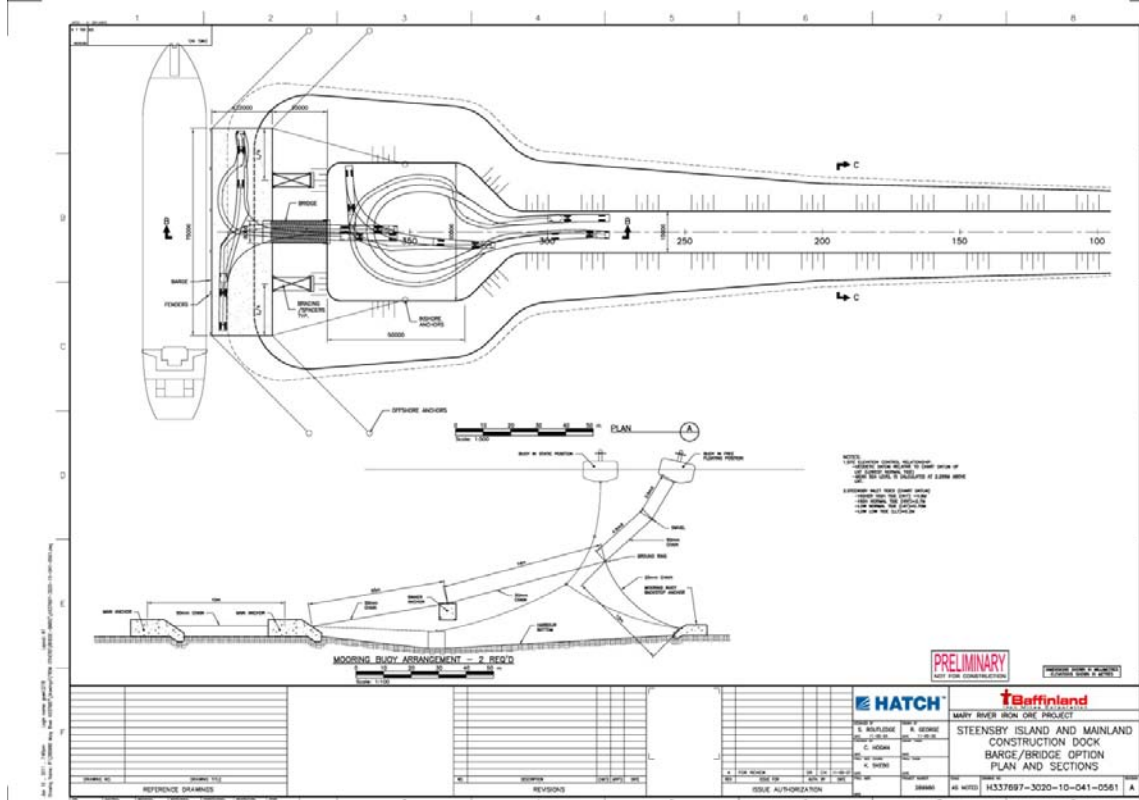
Steensby Island and Mainland Construction Dock Barge / Bridge Option Plan and Sections.
